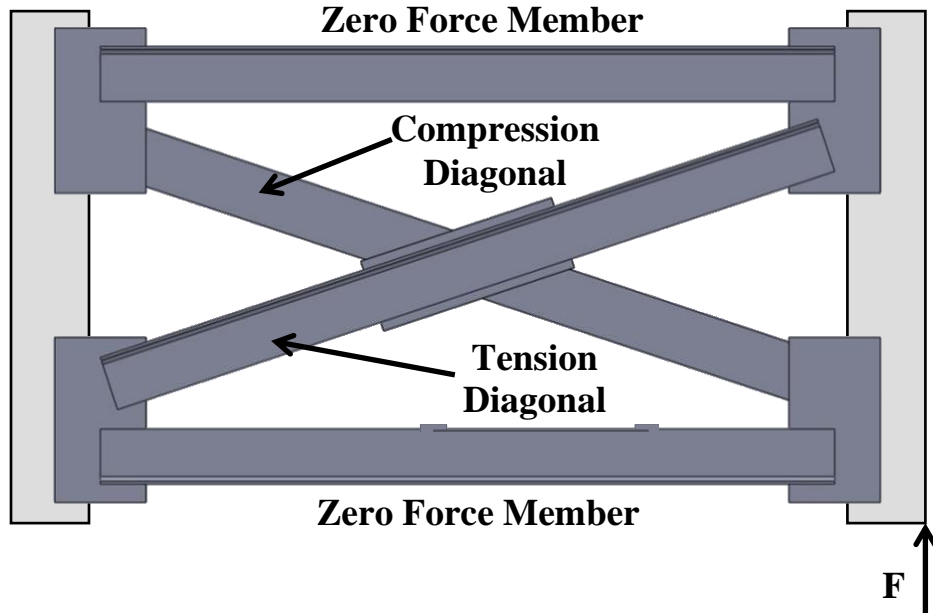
Typical Unequal Leg X Frame Specimen with Internal Forces due to Load
